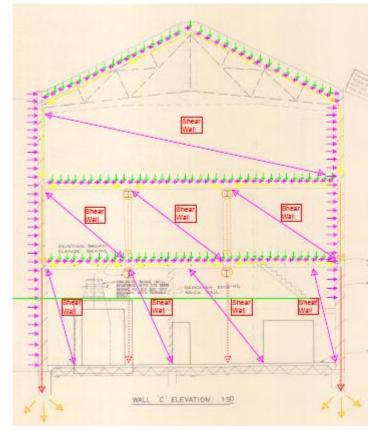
Southland Times Internal cross wall C typical transverse lateral load path
